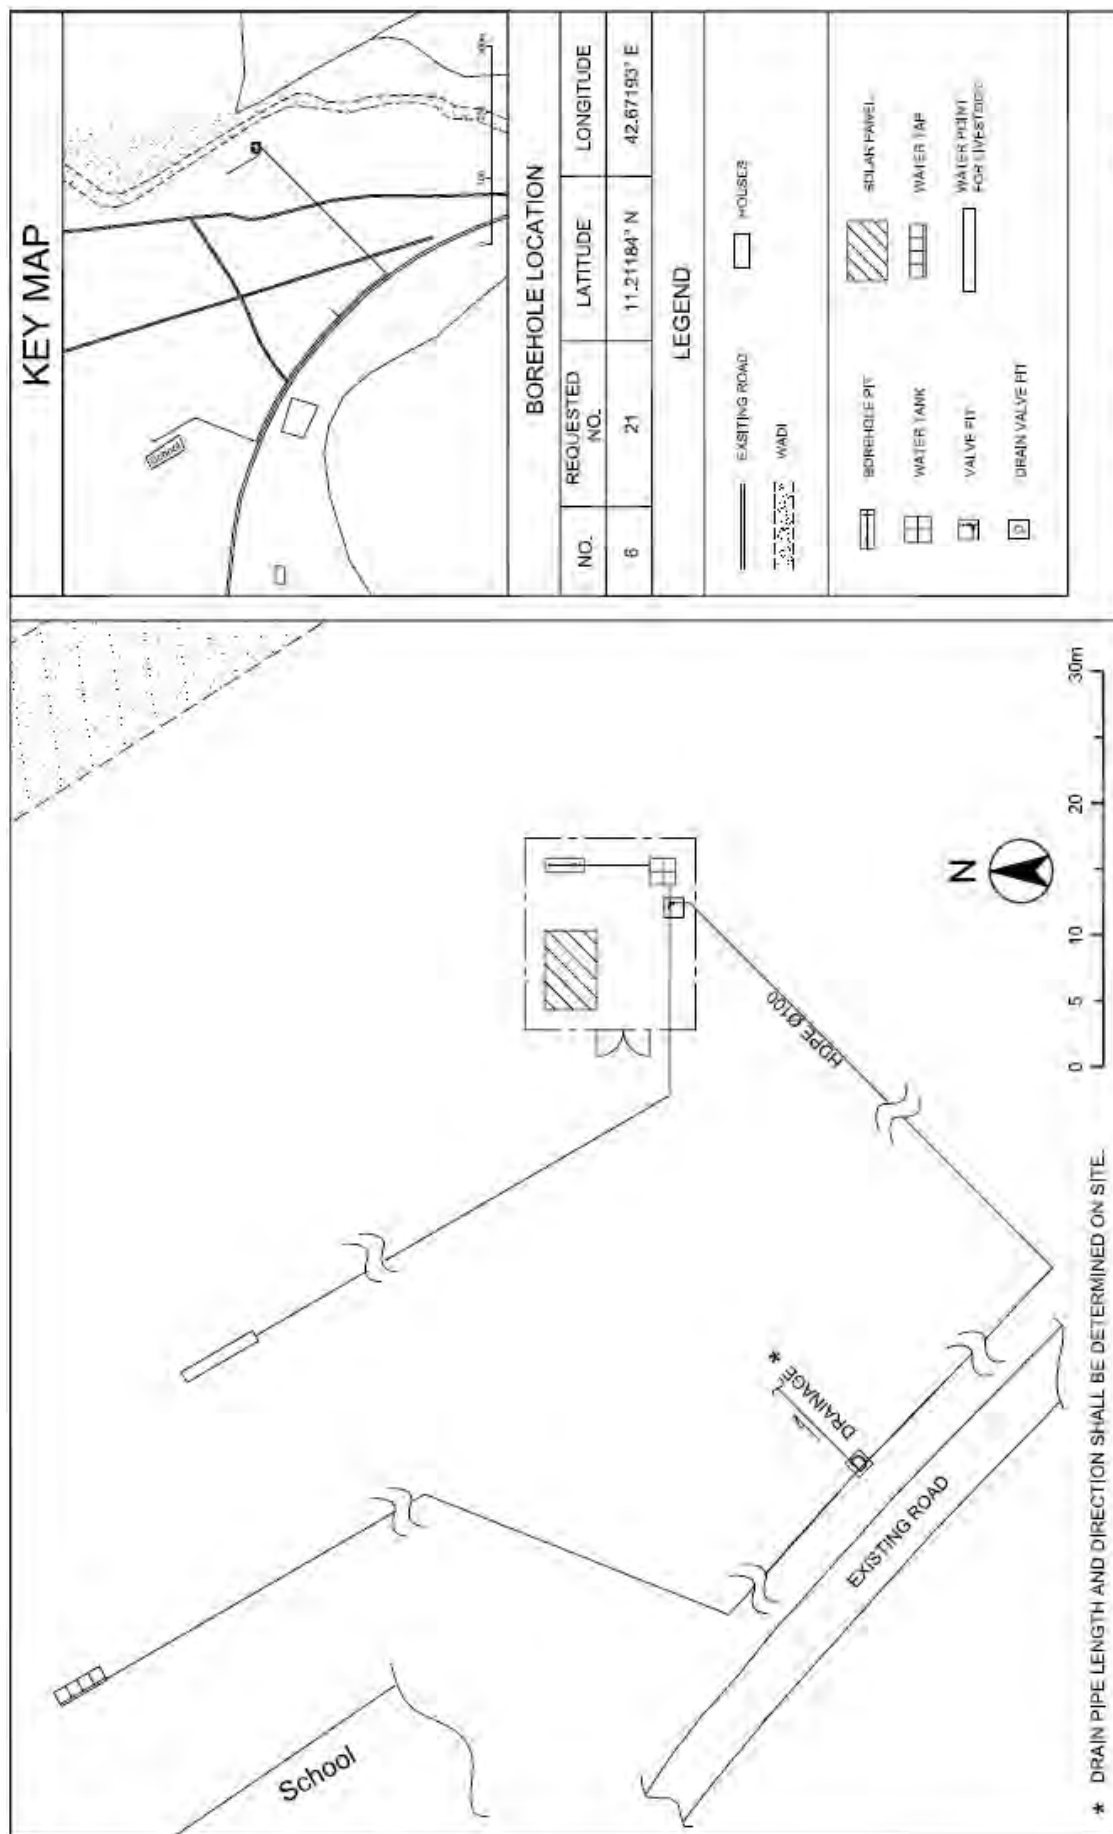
Layout of Facility (8) [Hambokta]
